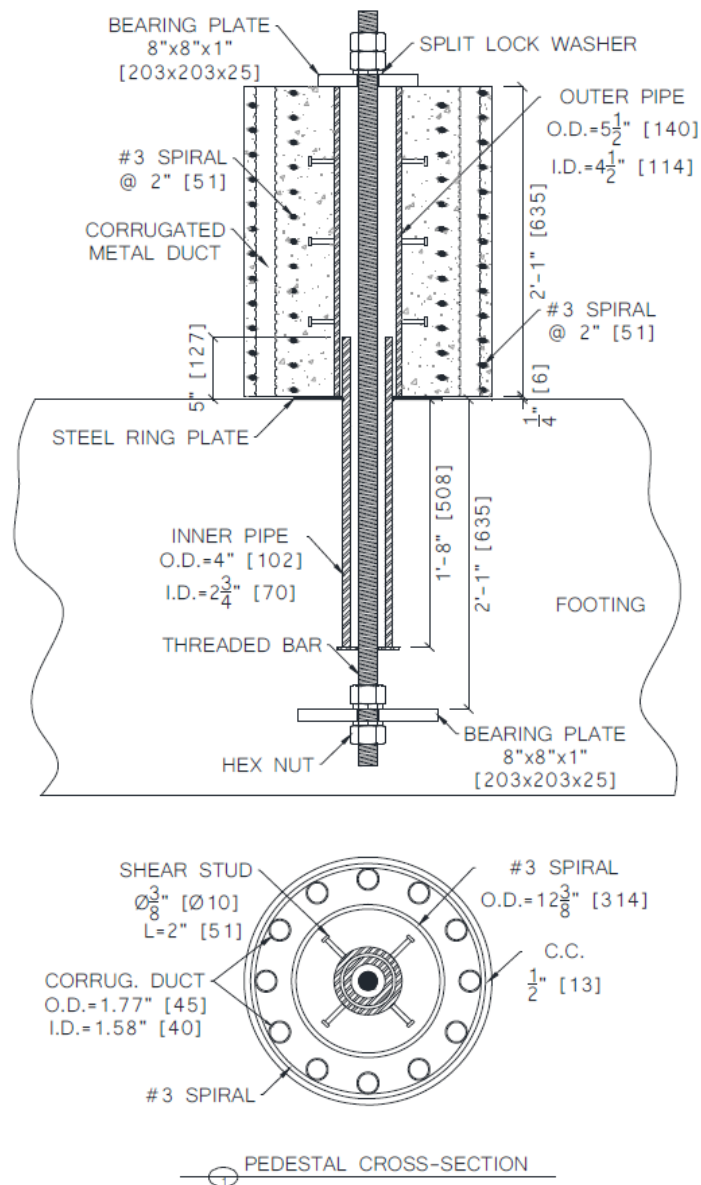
Telescopic Pipe Pin Connection Detail (courtesy of Mehrsoroush and Saiidi 2014)
